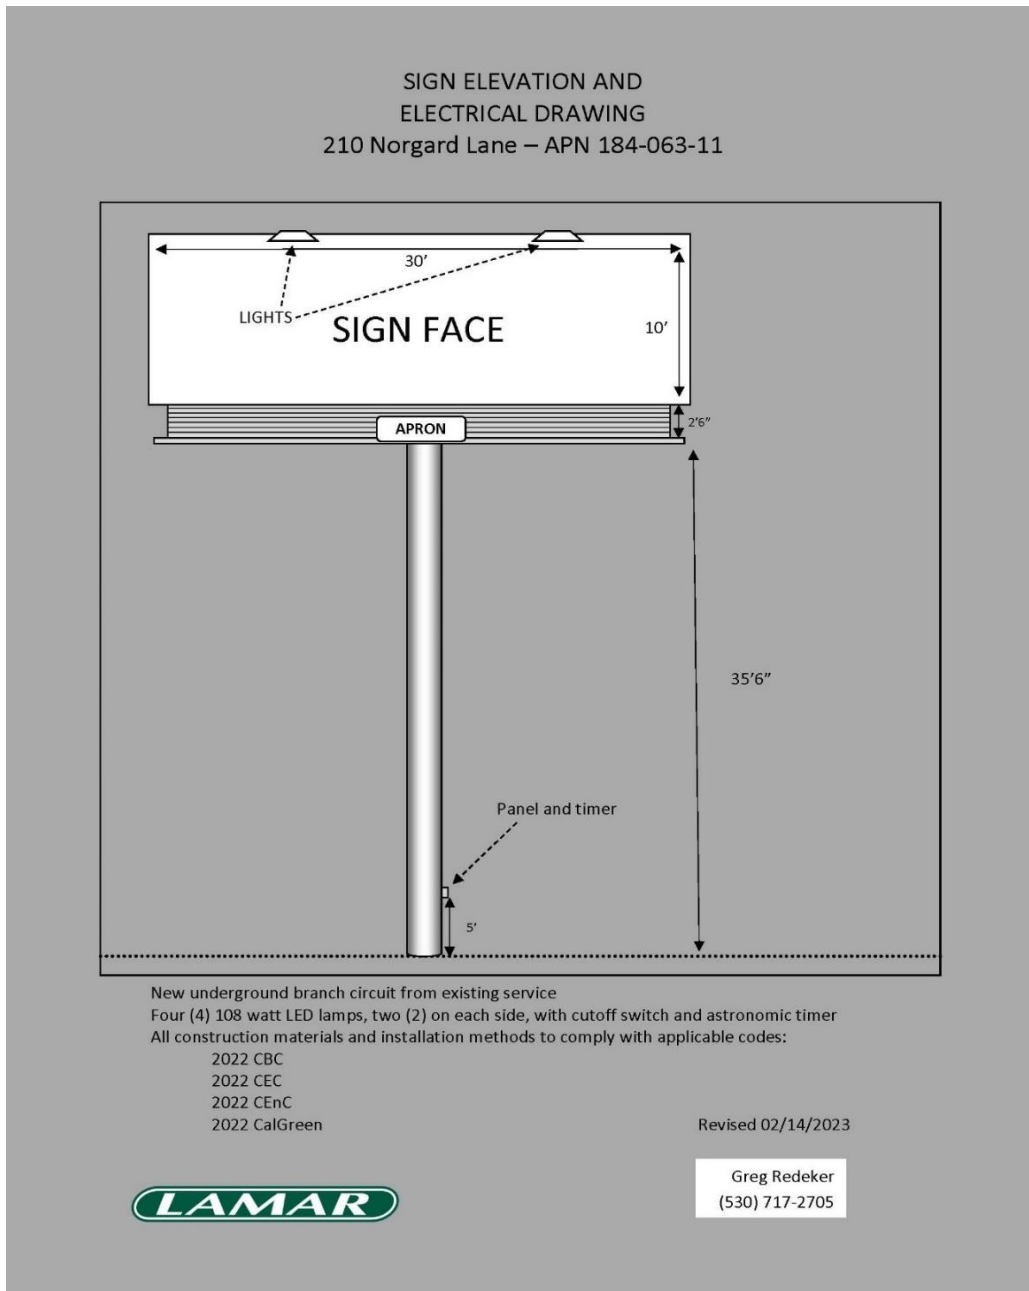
Elevation and lighting drawing (Provided by Applicant)
